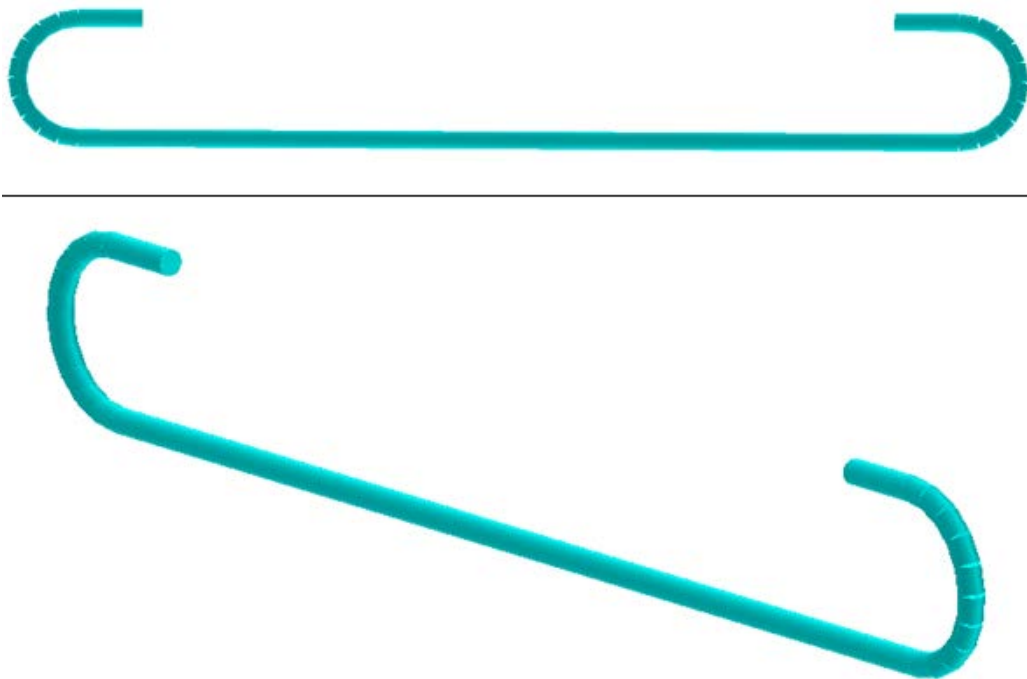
View of CRSI Rebar Bend Type -1 used in modeling
